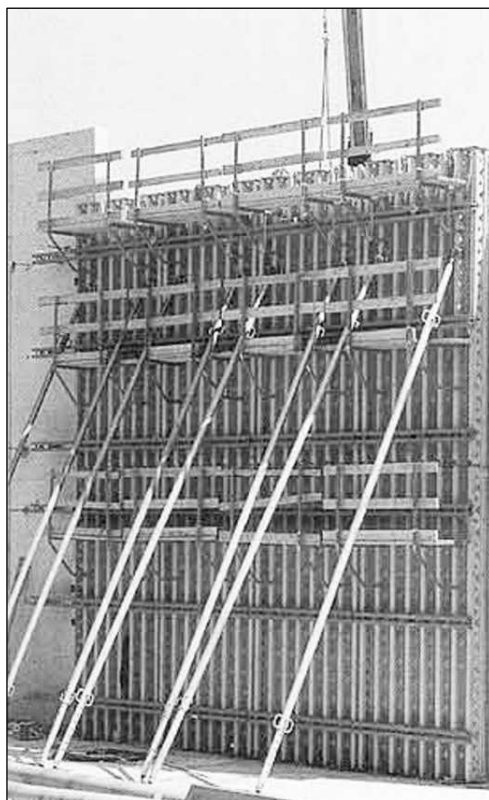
A Typical Vario GT 24 Panel Formwork (Courtesy PERI).
